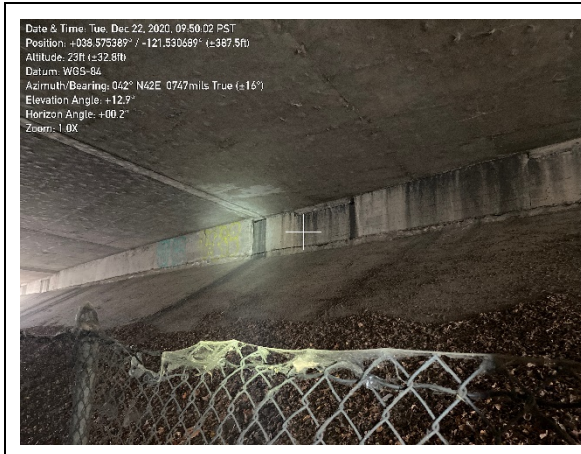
Habitat surrounding concrete girder bridge with multiple expansion joints, and crevices along abutments, consists of landscaped lawns, industrial buildings, and trees with clusters of dense leaf foliage and crevices for potential roost habitat (Location #35). Taken facing northeast.
